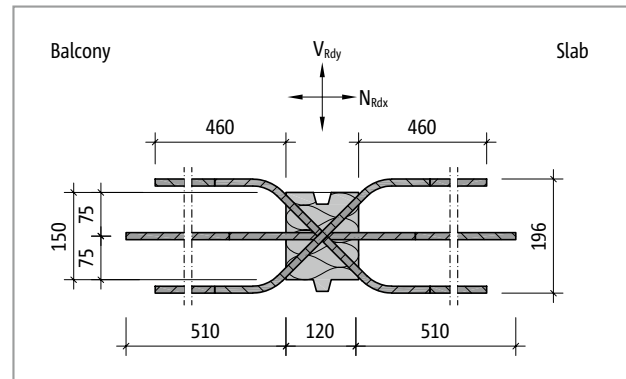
Schöck Isokorb® XT type H-VV2-NN1: Product plan view
